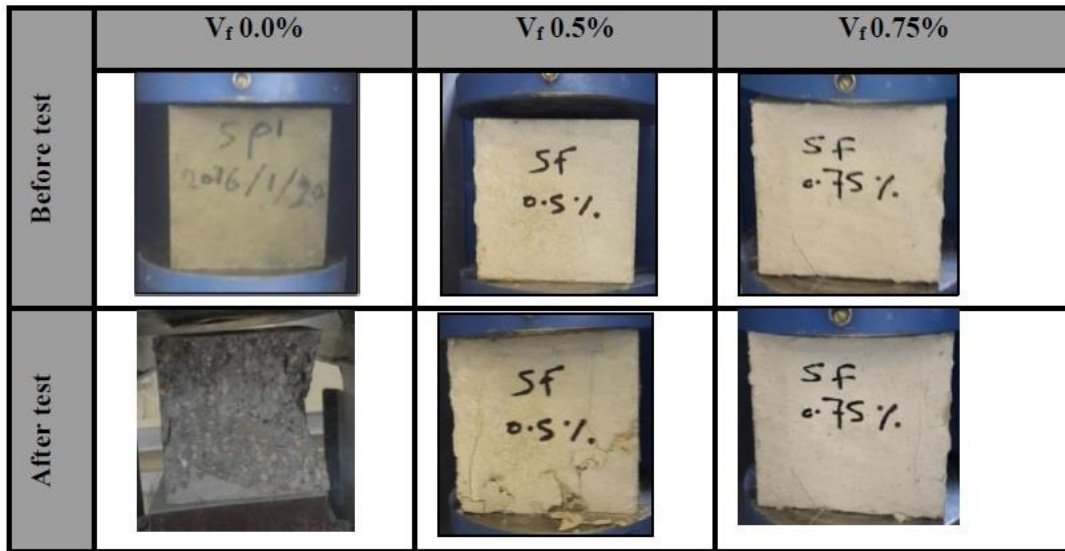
Cracking pattern at failure of concrete specimens of splitting tensile strength test specimens
